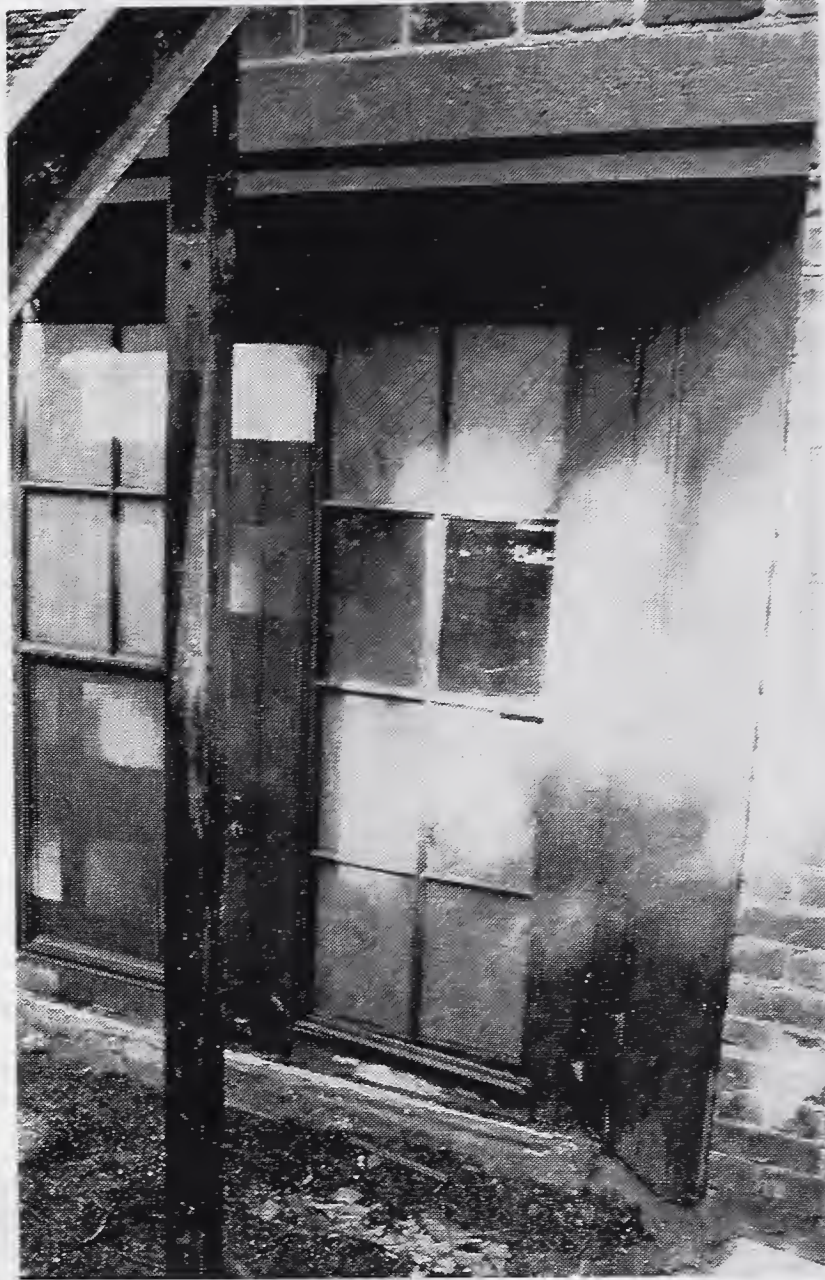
Damaged Door and Flashing at Ballroom Patio.
